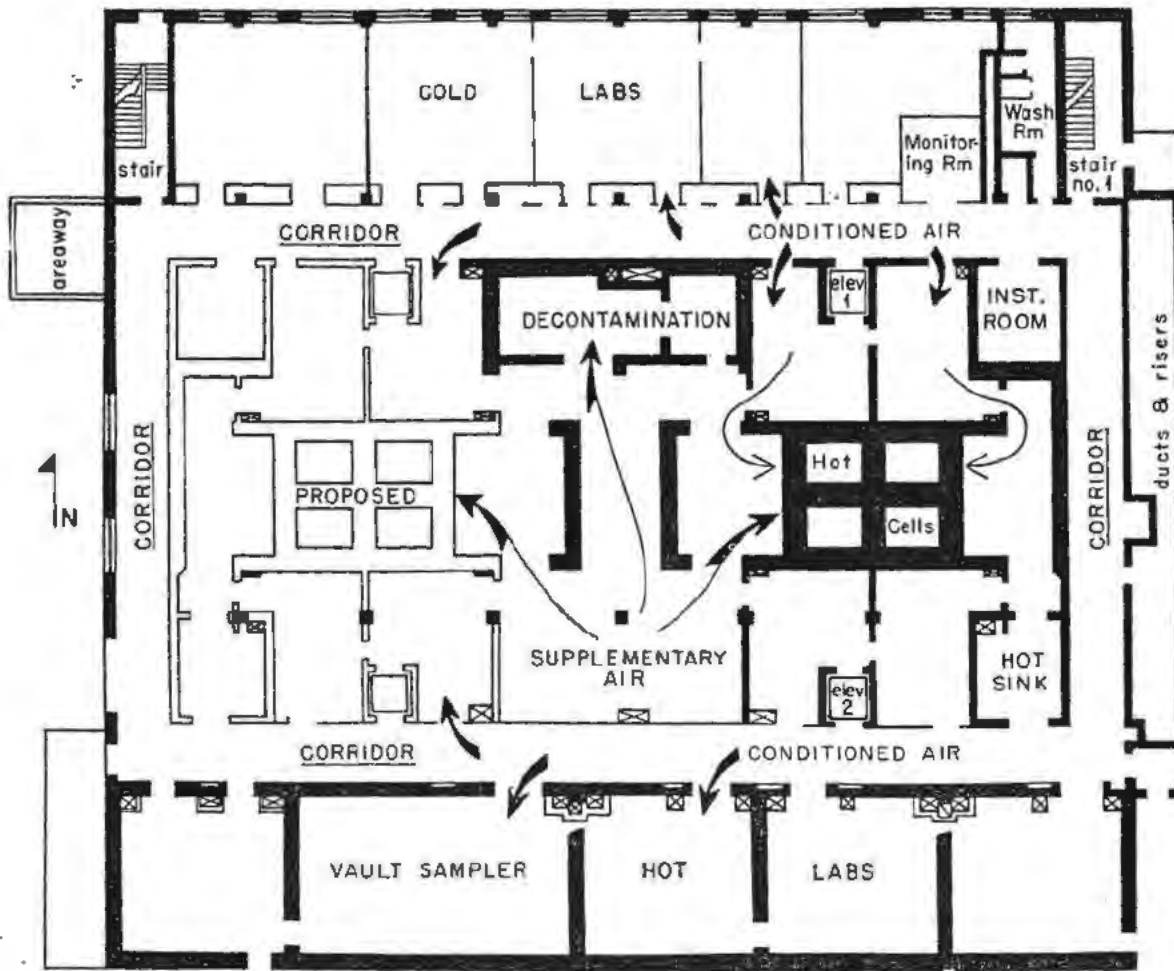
Floor plan of a radiochemical laboratory building with radiation zoning and air flow planning
